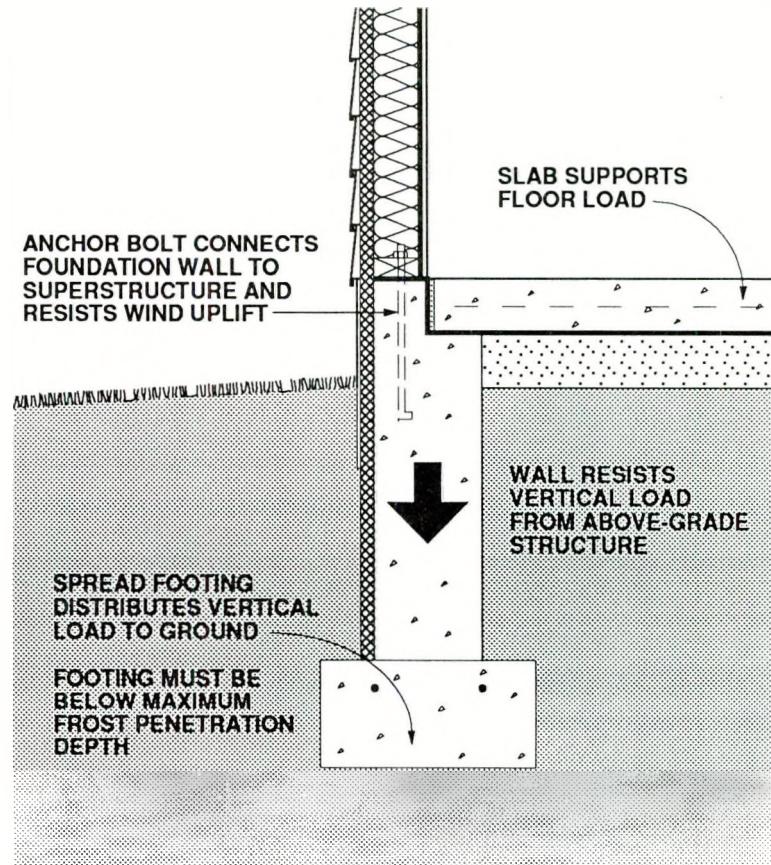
Structural Components of Slab-on-Grade Foundation with Stem Wall and Footing
